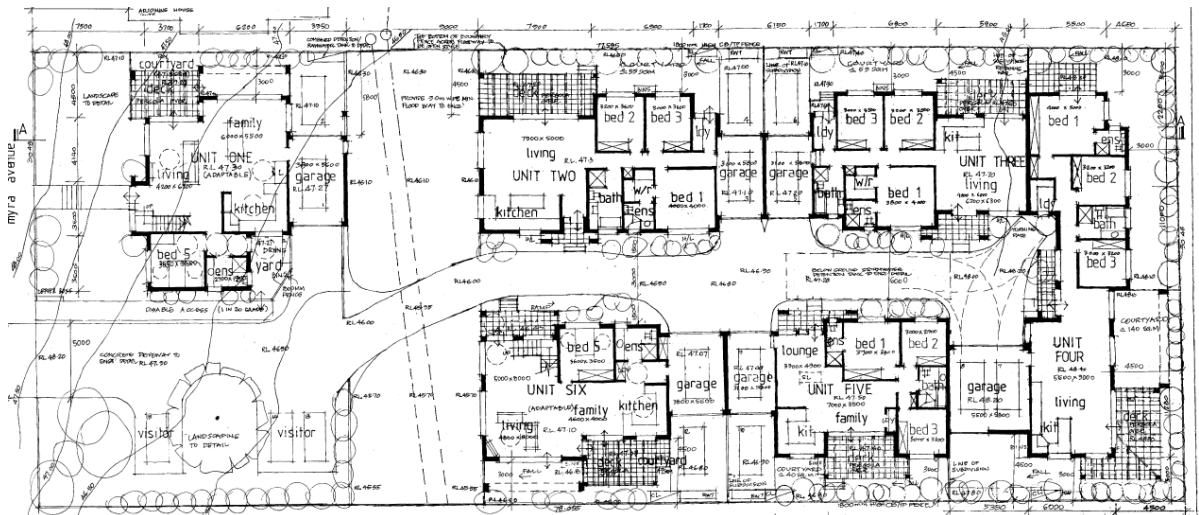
Proposal original submitted under LDA2020/185 including six (6) dwellings
